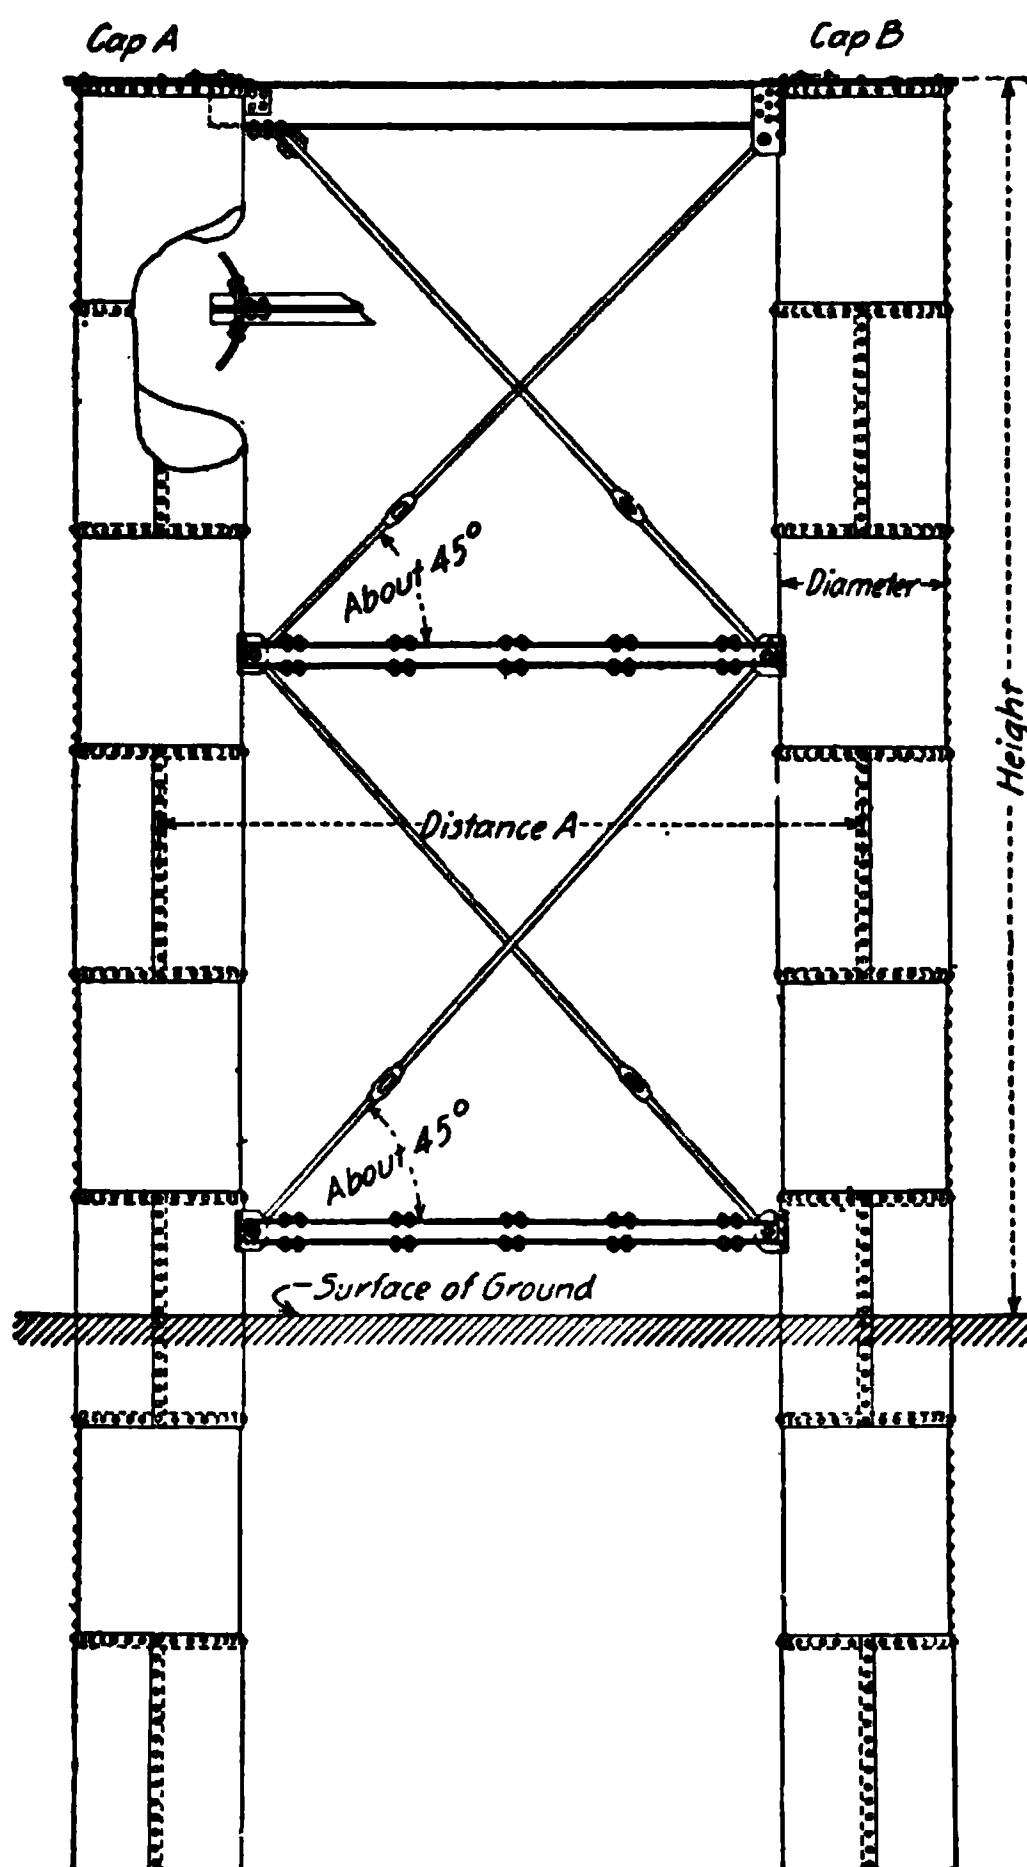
STEEL TUBULAR PIERS. (AMERICAN BRIDGE CO.)
